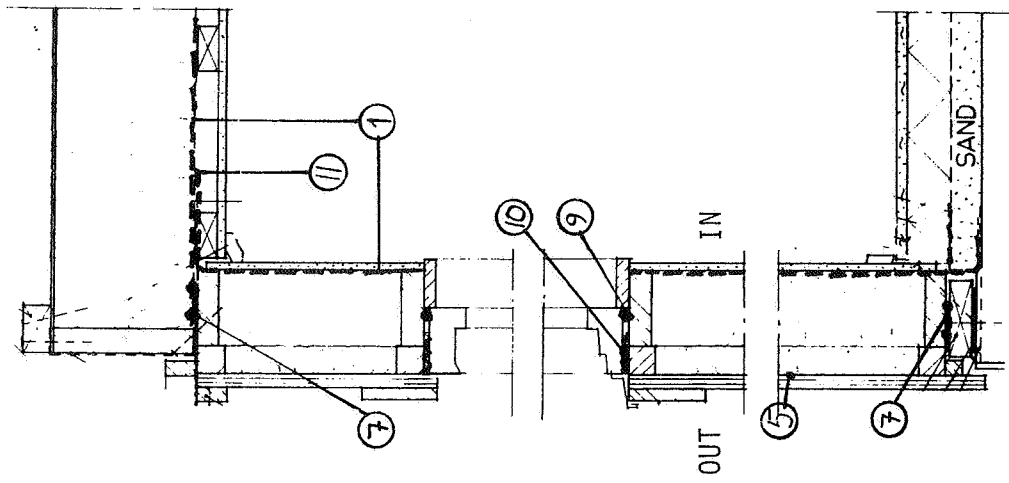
Wind barrier of paper, overlapping and taped vapour barrier. Wall section
